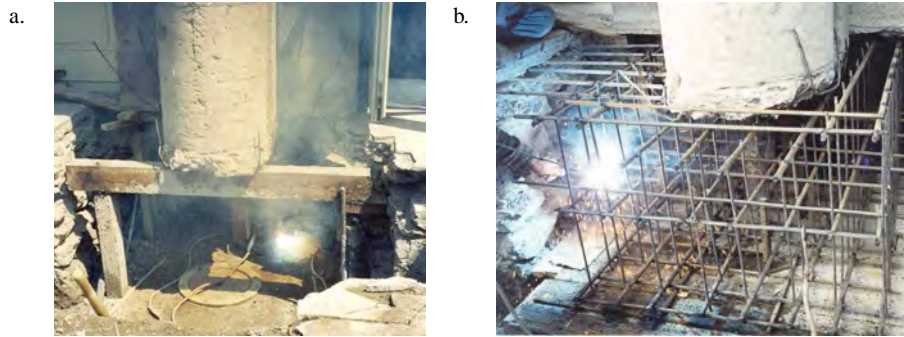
Temporary support under the one half of the existing column section (a), and existing column and the wall behind it are supported temporarily and the reinforcement frame of the upper pedestal is installed (b)
